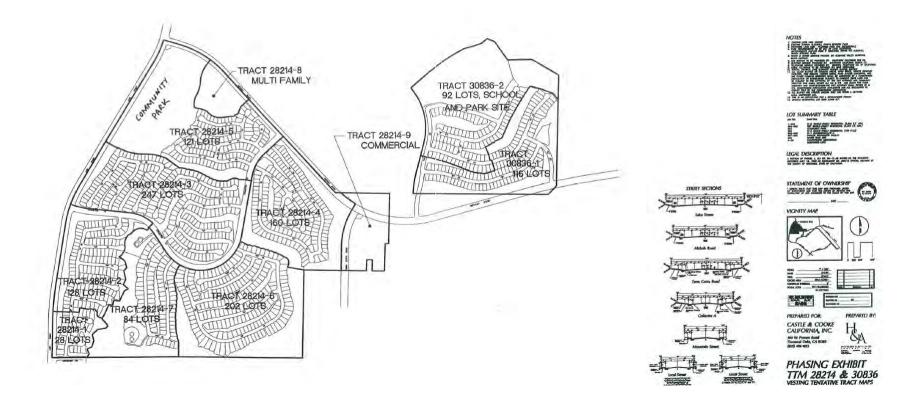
1997 Alberhill Ranch Specific Plan Amendment #3 (ARSP #3)
